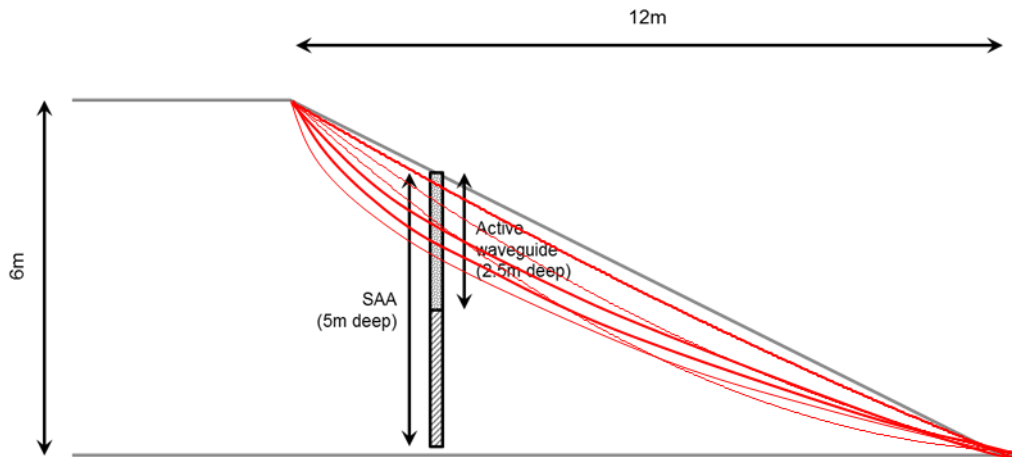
Cross-section of installation at Nafferton embankment with possible failure surfaces superimposed (red lines)
